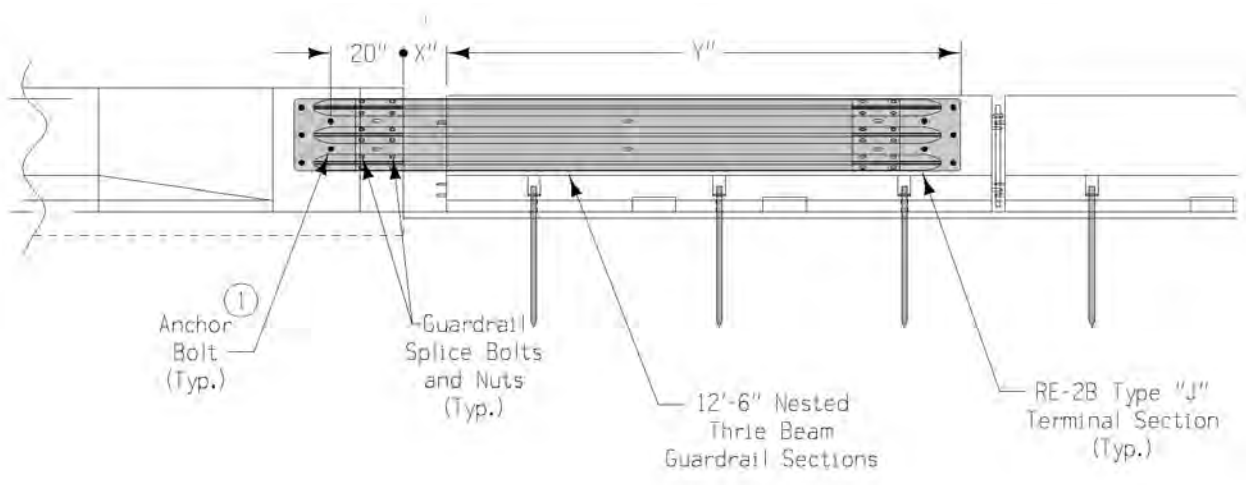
Proposed Iowa Layout for TCB to Bridge Rail Connection
